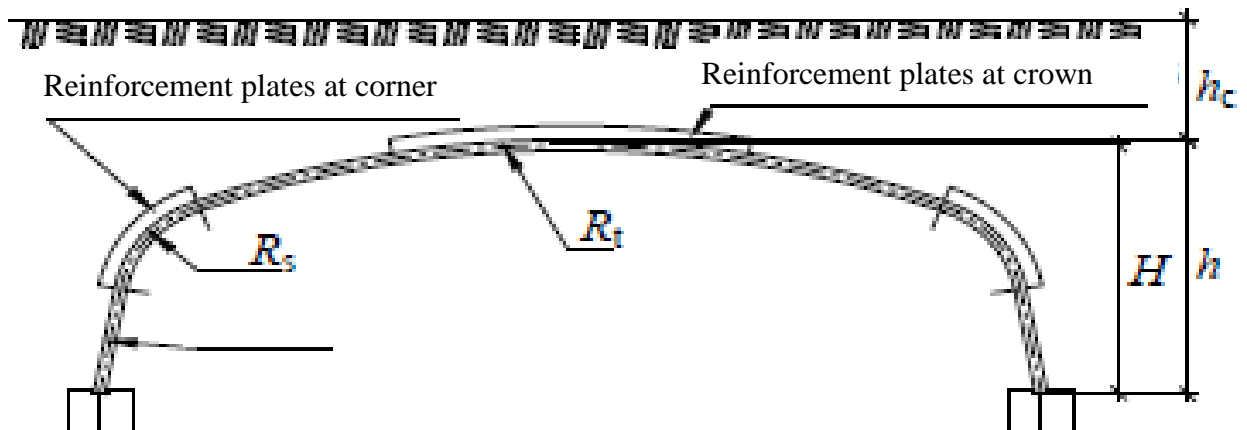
Box culverts with reinforcement plates in crown and corner region
